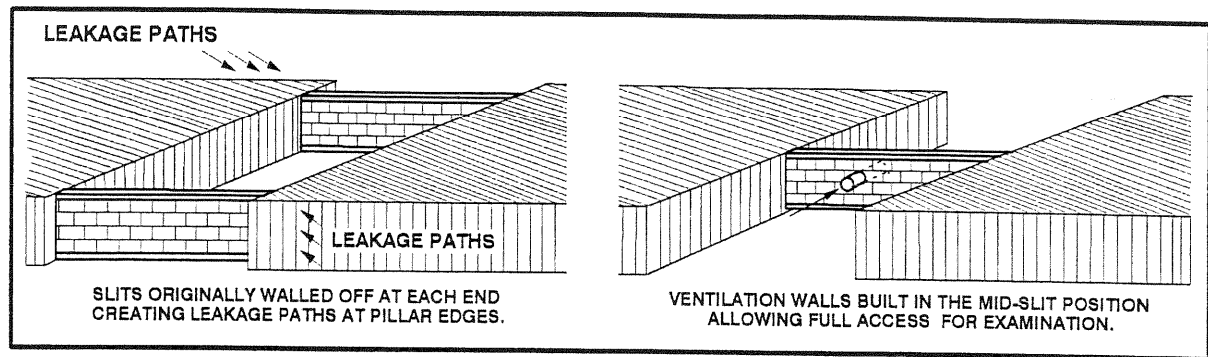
Ventilation Walls in Ladder-Road Cross-Slits
